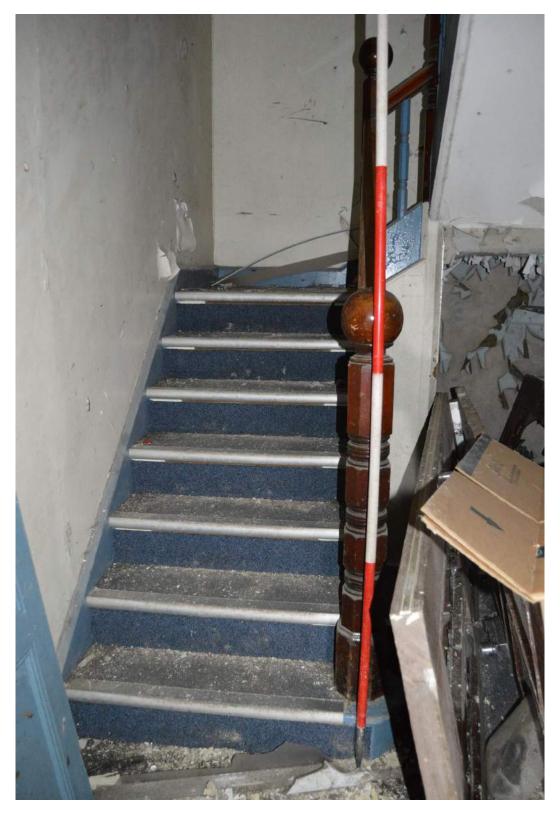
Stairs to first floor of administration range. Scale 2m.
